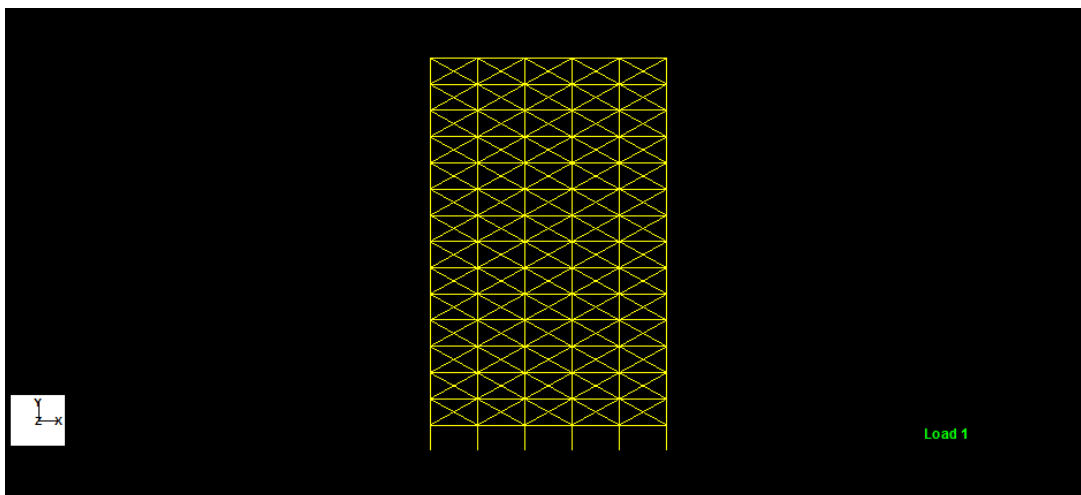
Elevation of Multi-Storeyed Building With Cross (X) Bracings
